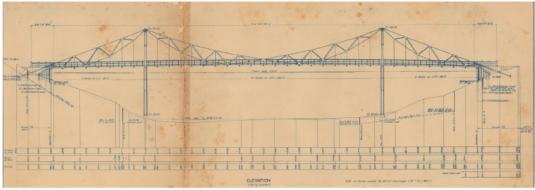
Kindee Bridge - Original Drawings - Elevation
